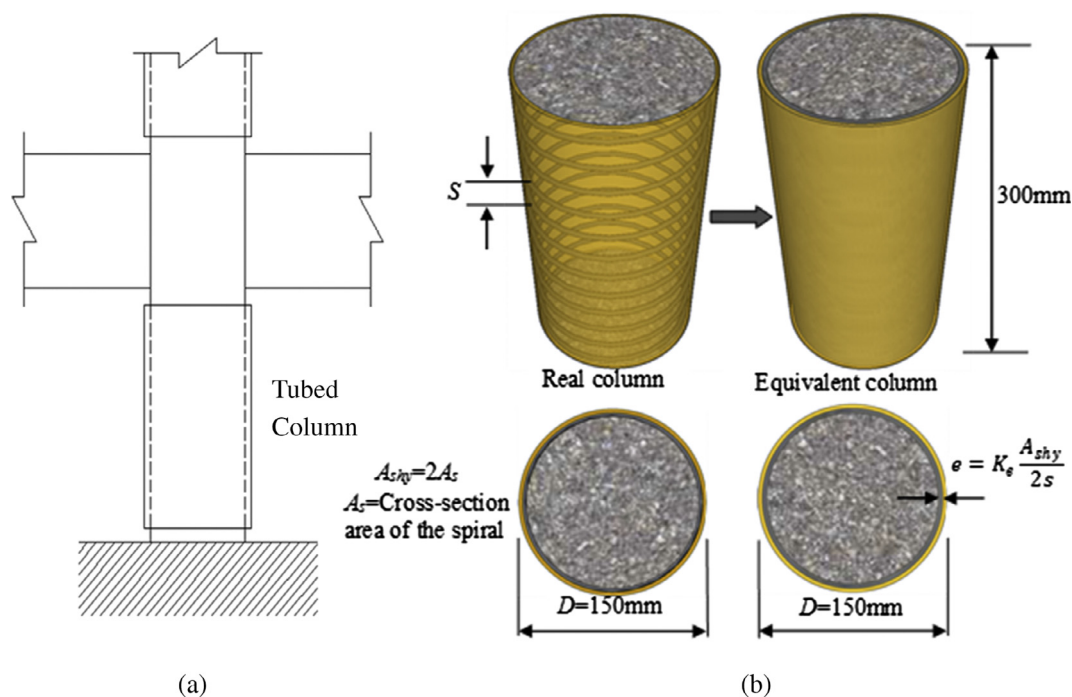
(a) Tubed column and (b) equivalent steel-confined concrete column concept.
